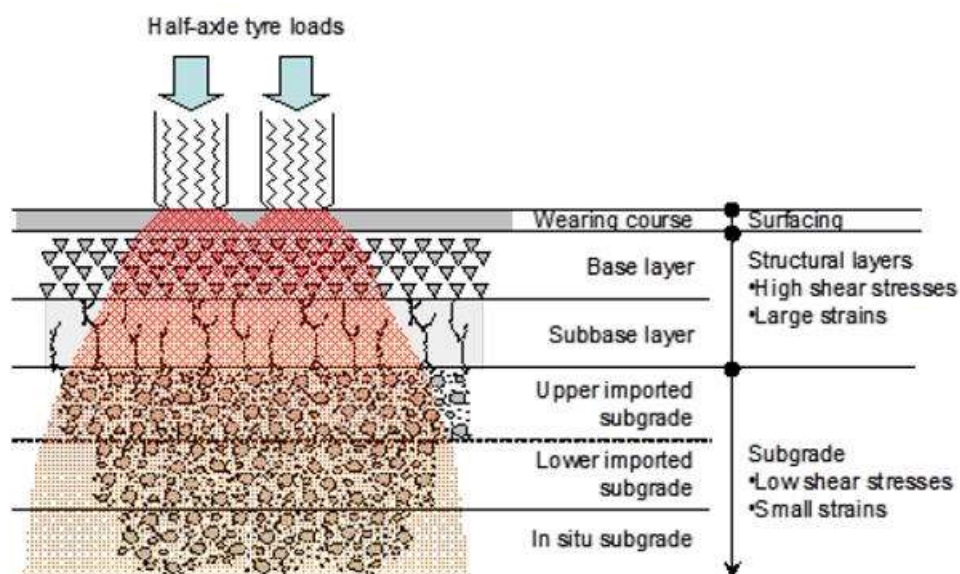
1: Load Transfer through the Pavement Structure (SAPEM, 2013)
